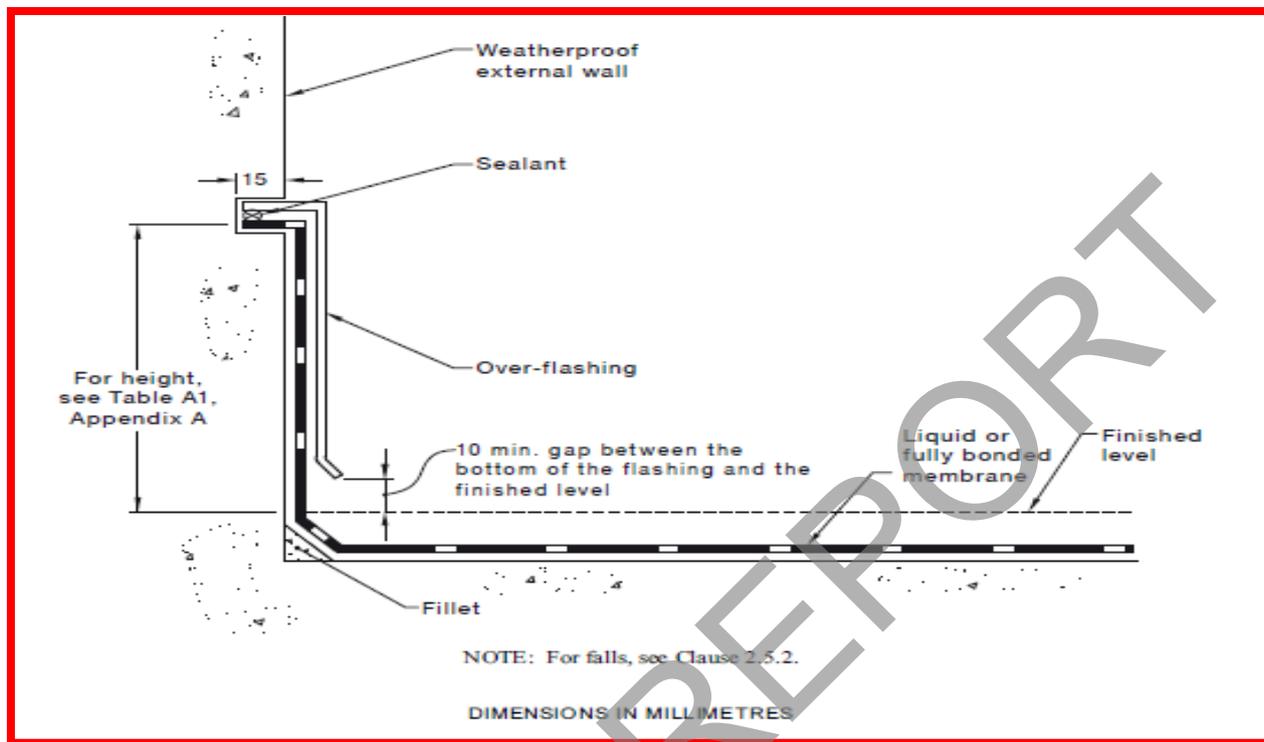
Figure 2.2 Typical Vertical Upward Termination - Detail Of Over-Flashing For Liquid Or Full Bonded Sheet Membranes
